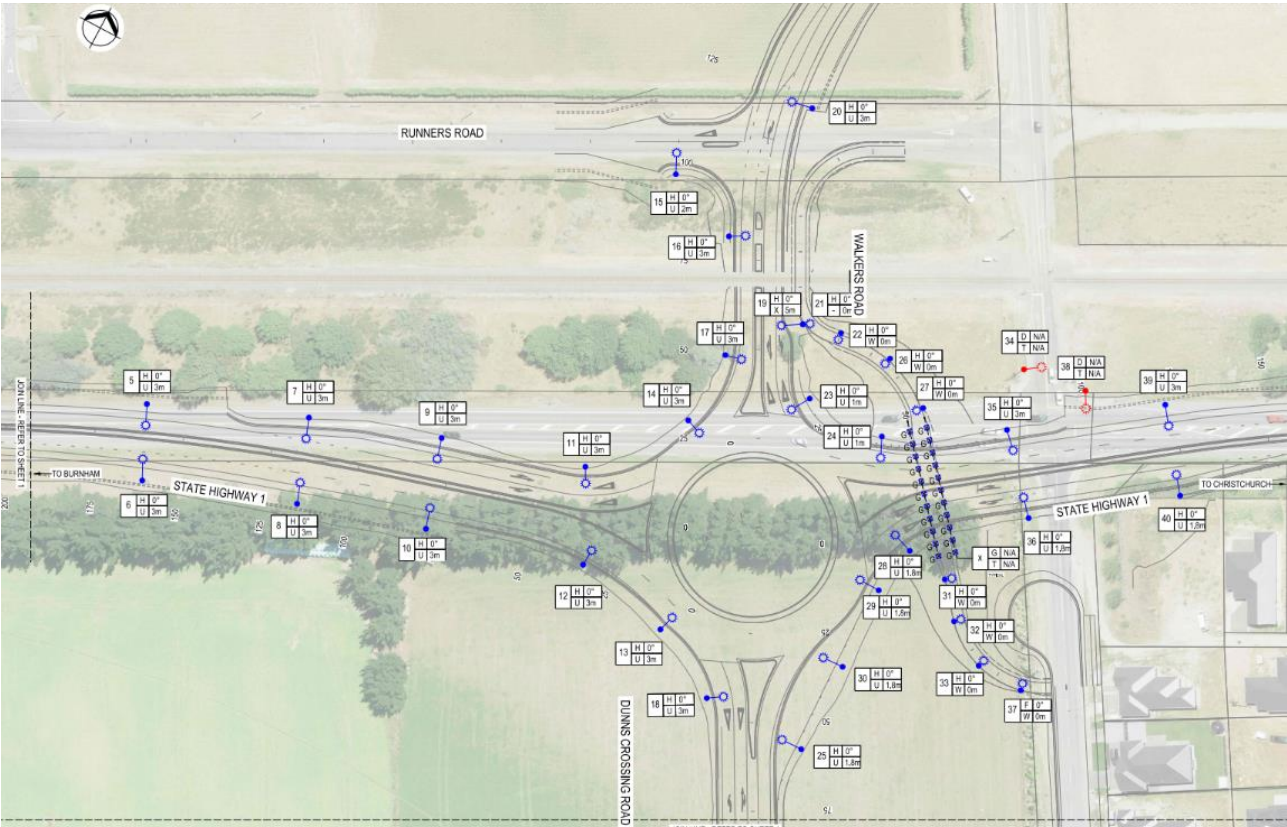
Lighting Layout Plan DWG No: 3338703-10-CU-3512
